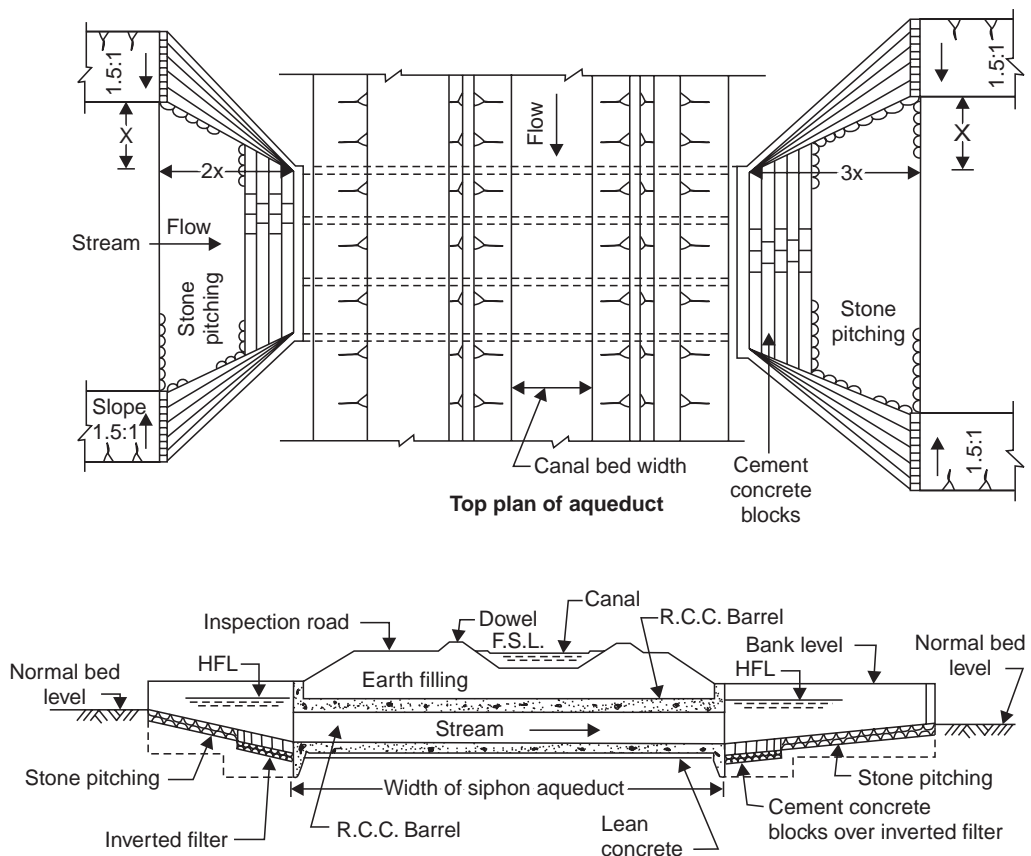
(a) Typical plan and section of a siphon aqueduct (Type I) (1)
